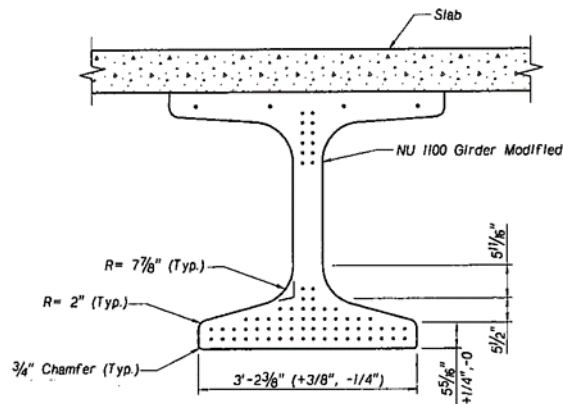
Girder reinforcement and strand distribution, from the construction documents of Wood River Interchange Bridge, courtesy of NDOT
